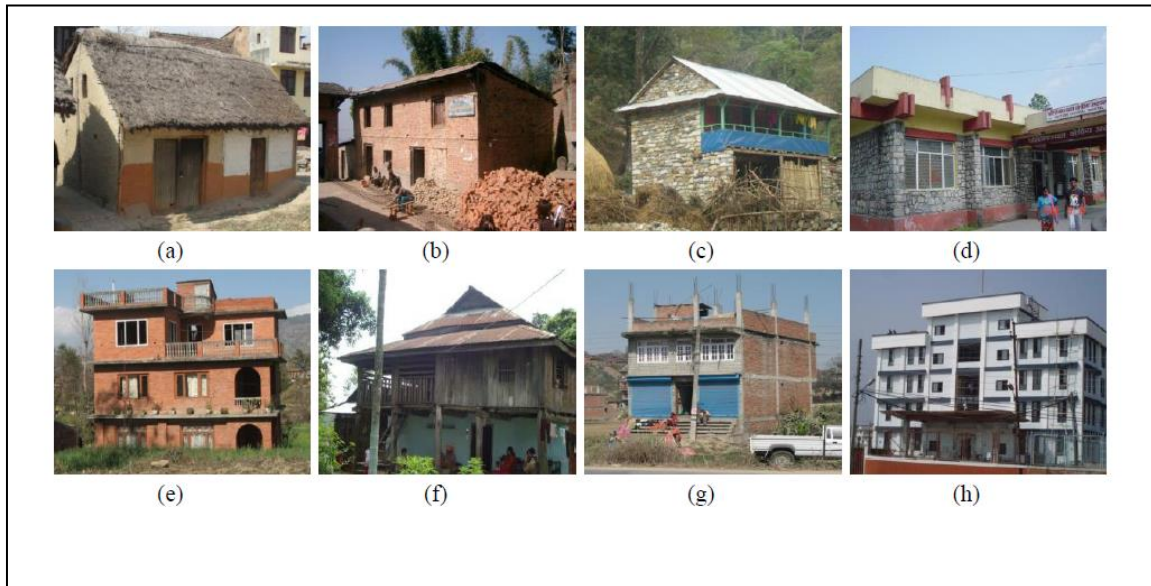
Existing building typologies in Nepal: (a) Adobe, (b) Brick in mud mortar, (c) stone in mud mortar, (d) Brick in cement mortar, (e) Stone (Fired Brick) in cement mortar, (f) Wooden, (g) Non-engineered building, and (h) Engineered building
